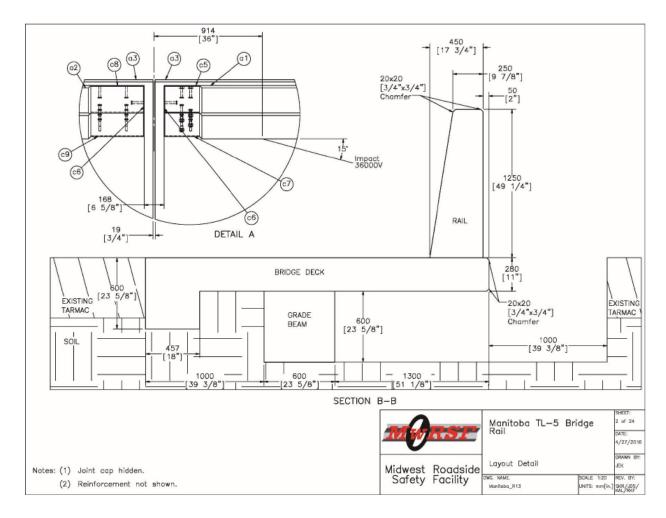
Layout detail, Test No. MAN-1, reprinted from [15]
